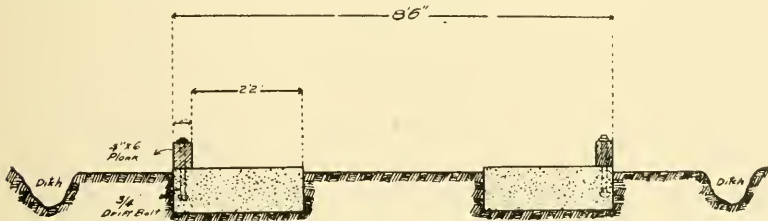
Cross section of concrete road. Scale—1 inch equals 2 feet.
